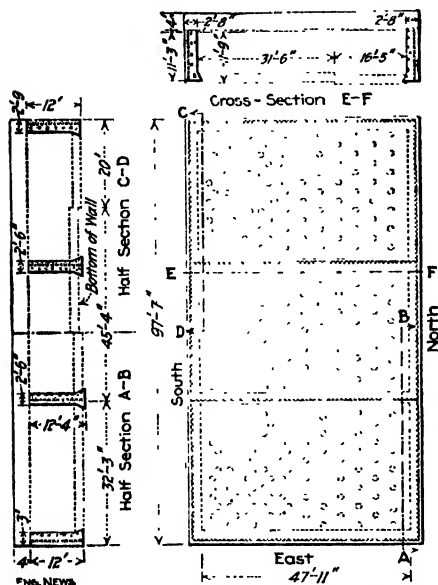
b*.—Reinforced-Concrete Pier Footing, Kingshighway Viaduct, St. Louis, Mo.
